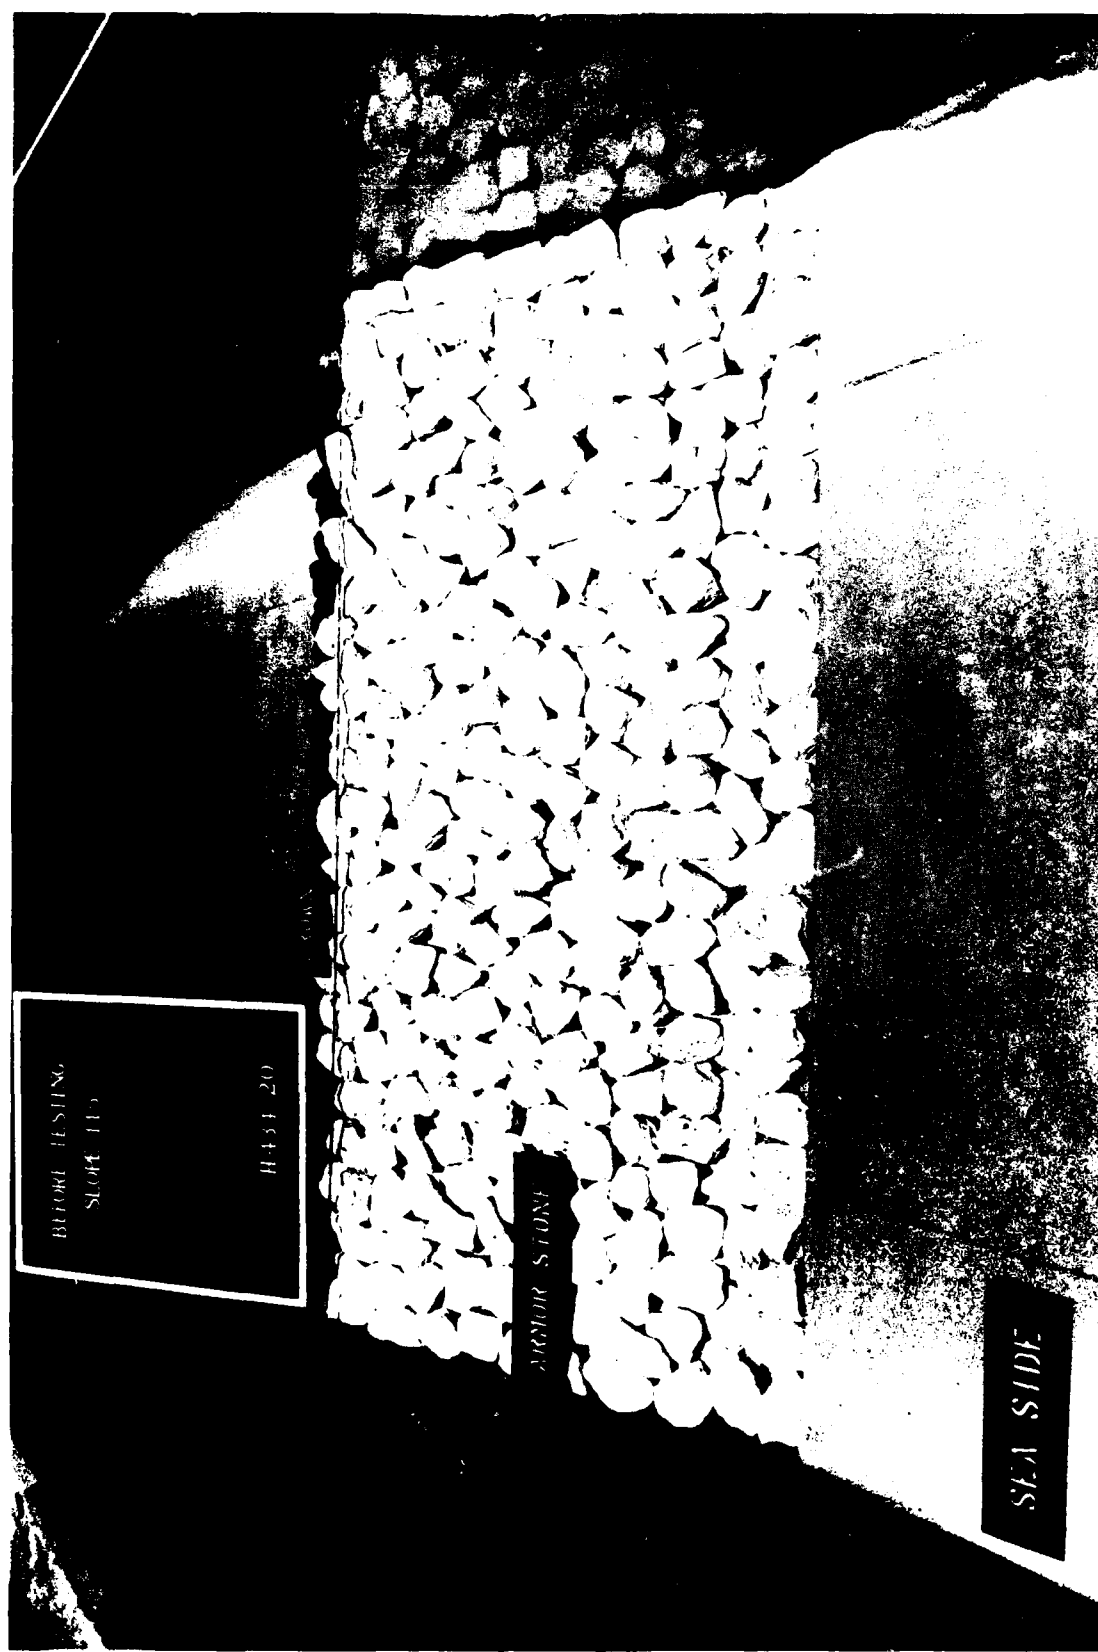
Sea-side view of a typical stone section before wave attack at a 1V-on-1.5H sea-side structure slope;  $W_a = 0.71 \text{ lb}$
